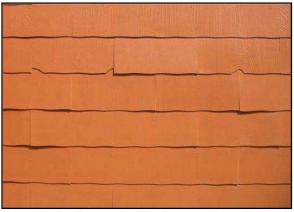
Detail of exterior siding (courtesy of Angelica Dion)
